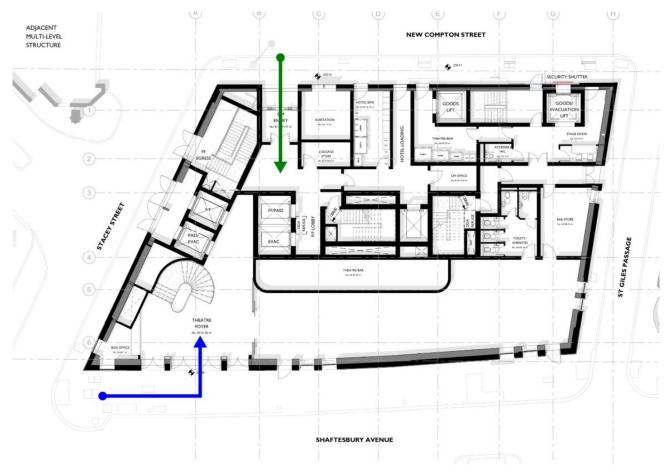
4 Ground floor level entrances. Theatre (Blue) and Hotel (Green)
